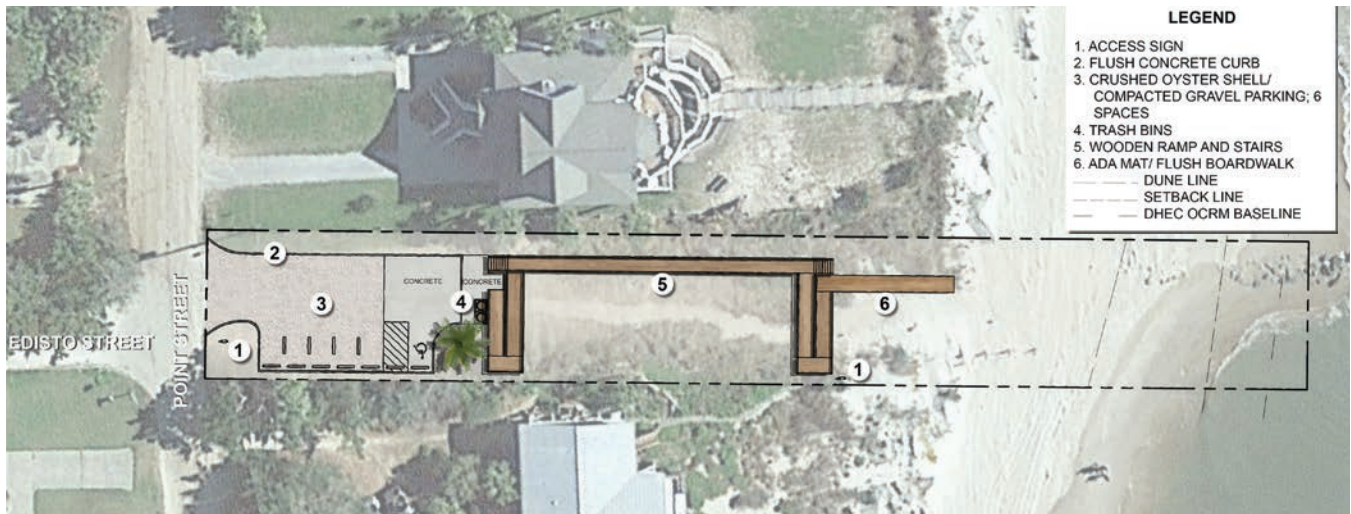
EDISTO STREET BEACH ACCESS CONCEPT B
